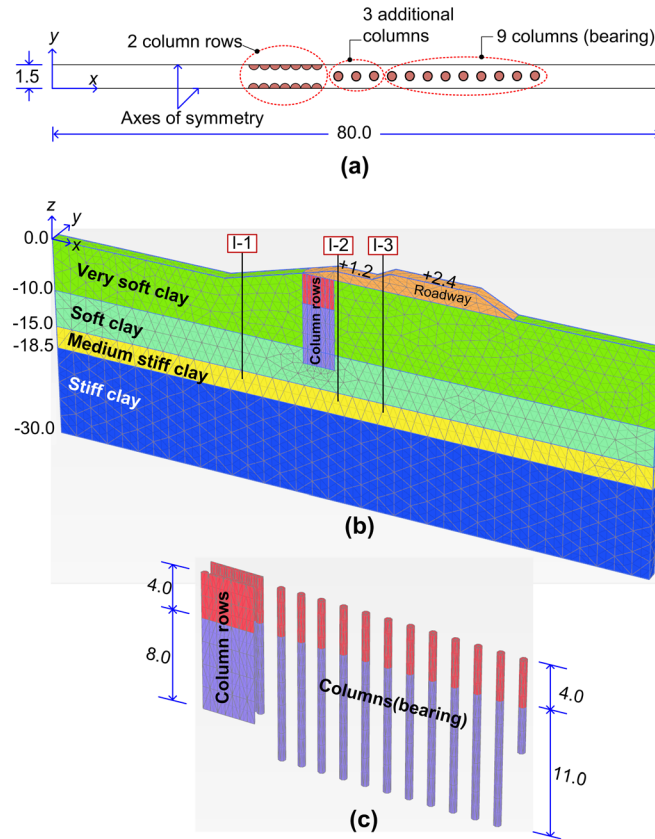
a Plan view of the analysis zone, b 3D finite element mesh, and c enlargement of modeling column rows and columns in bearing zone
